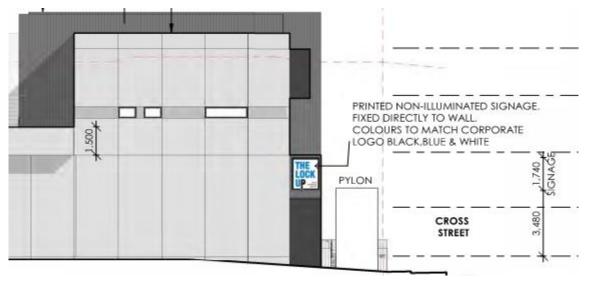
West elevation extract showing wall sign (Source: Pace Architects)
